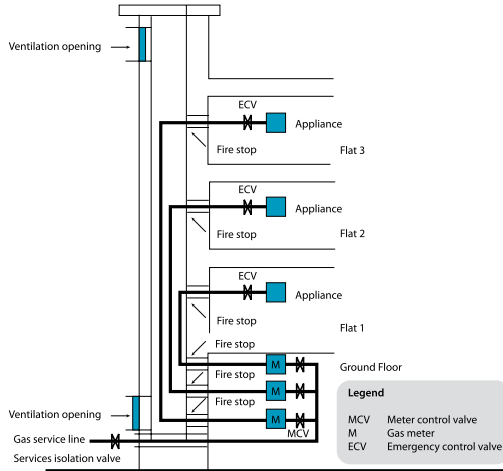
A typical natural gas piping layout on domestic consumer's premises
